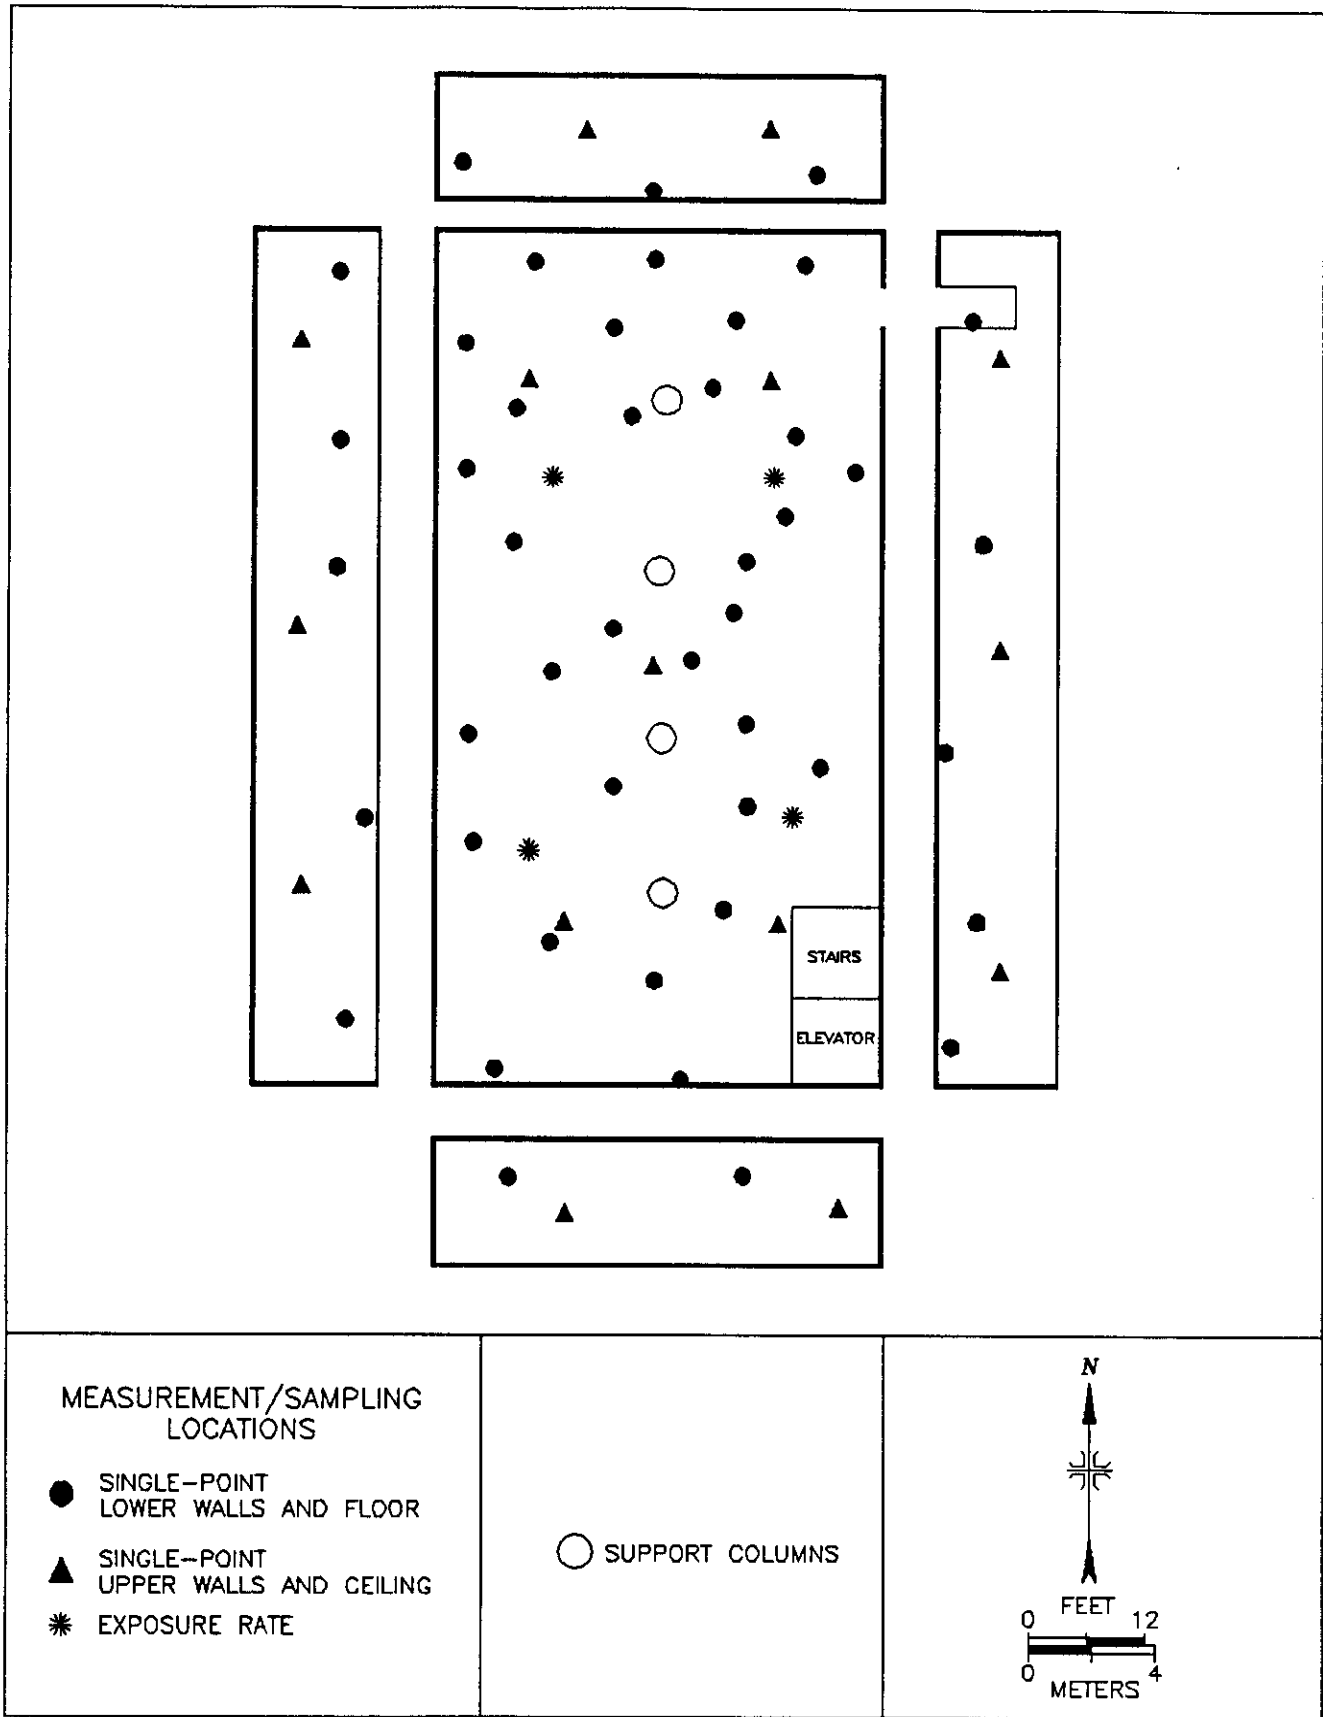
Sixth Floor, West Bay – Measurement and Sampling Locations
